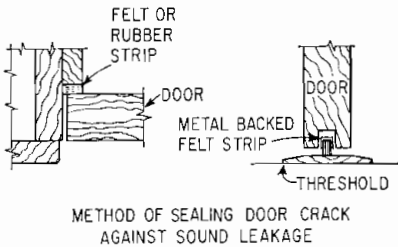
Normal methods for sealing the control-room door. The door itself should be of a heavy type to improve isolation of the control room.
